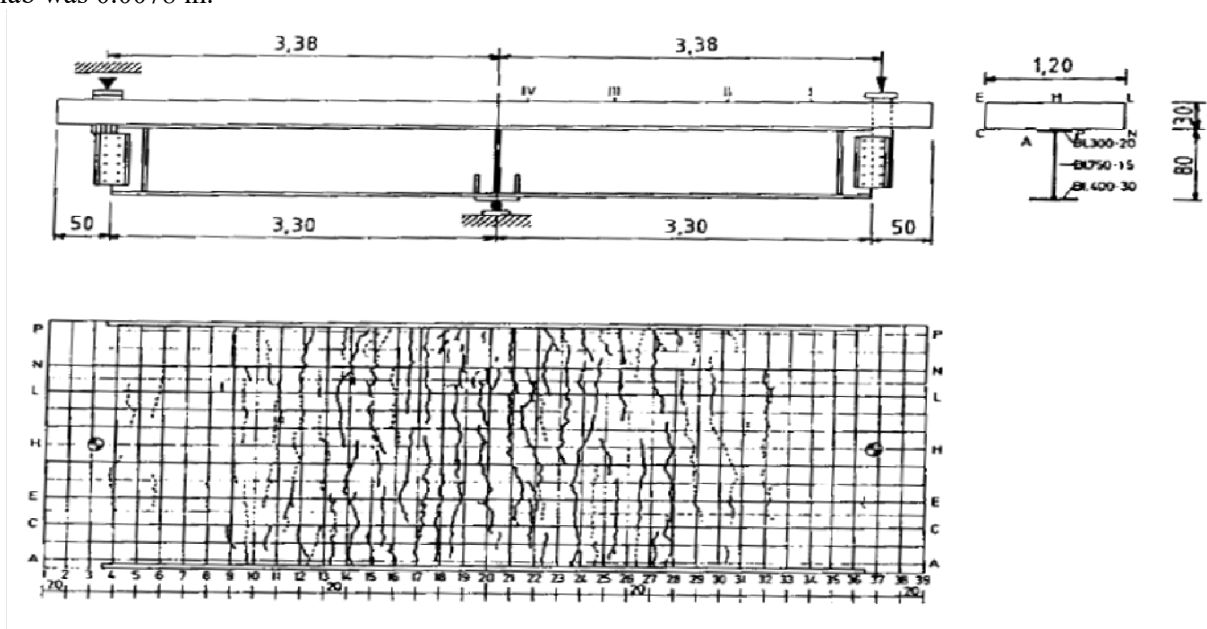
Test specimen details and crack distribution in the tested double composite bridge by Saul (1997)
